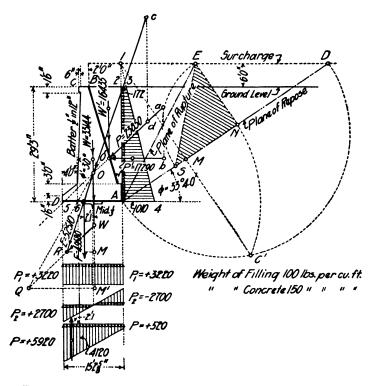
RETAINING WALL, WEST ALAMEDA AVENUE SUBWAY.
